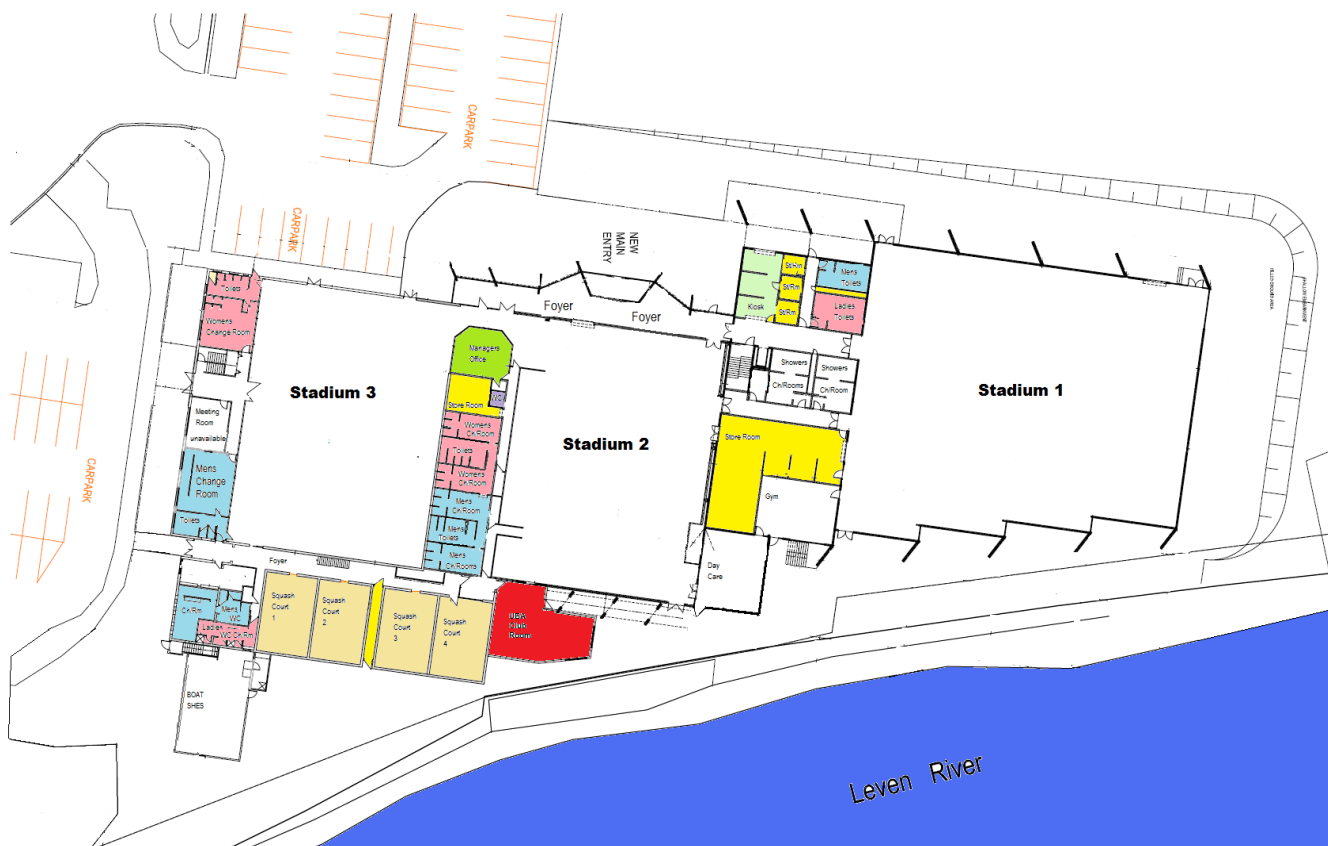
Existing Sport and Leisure Centre Ground Floor Layout
